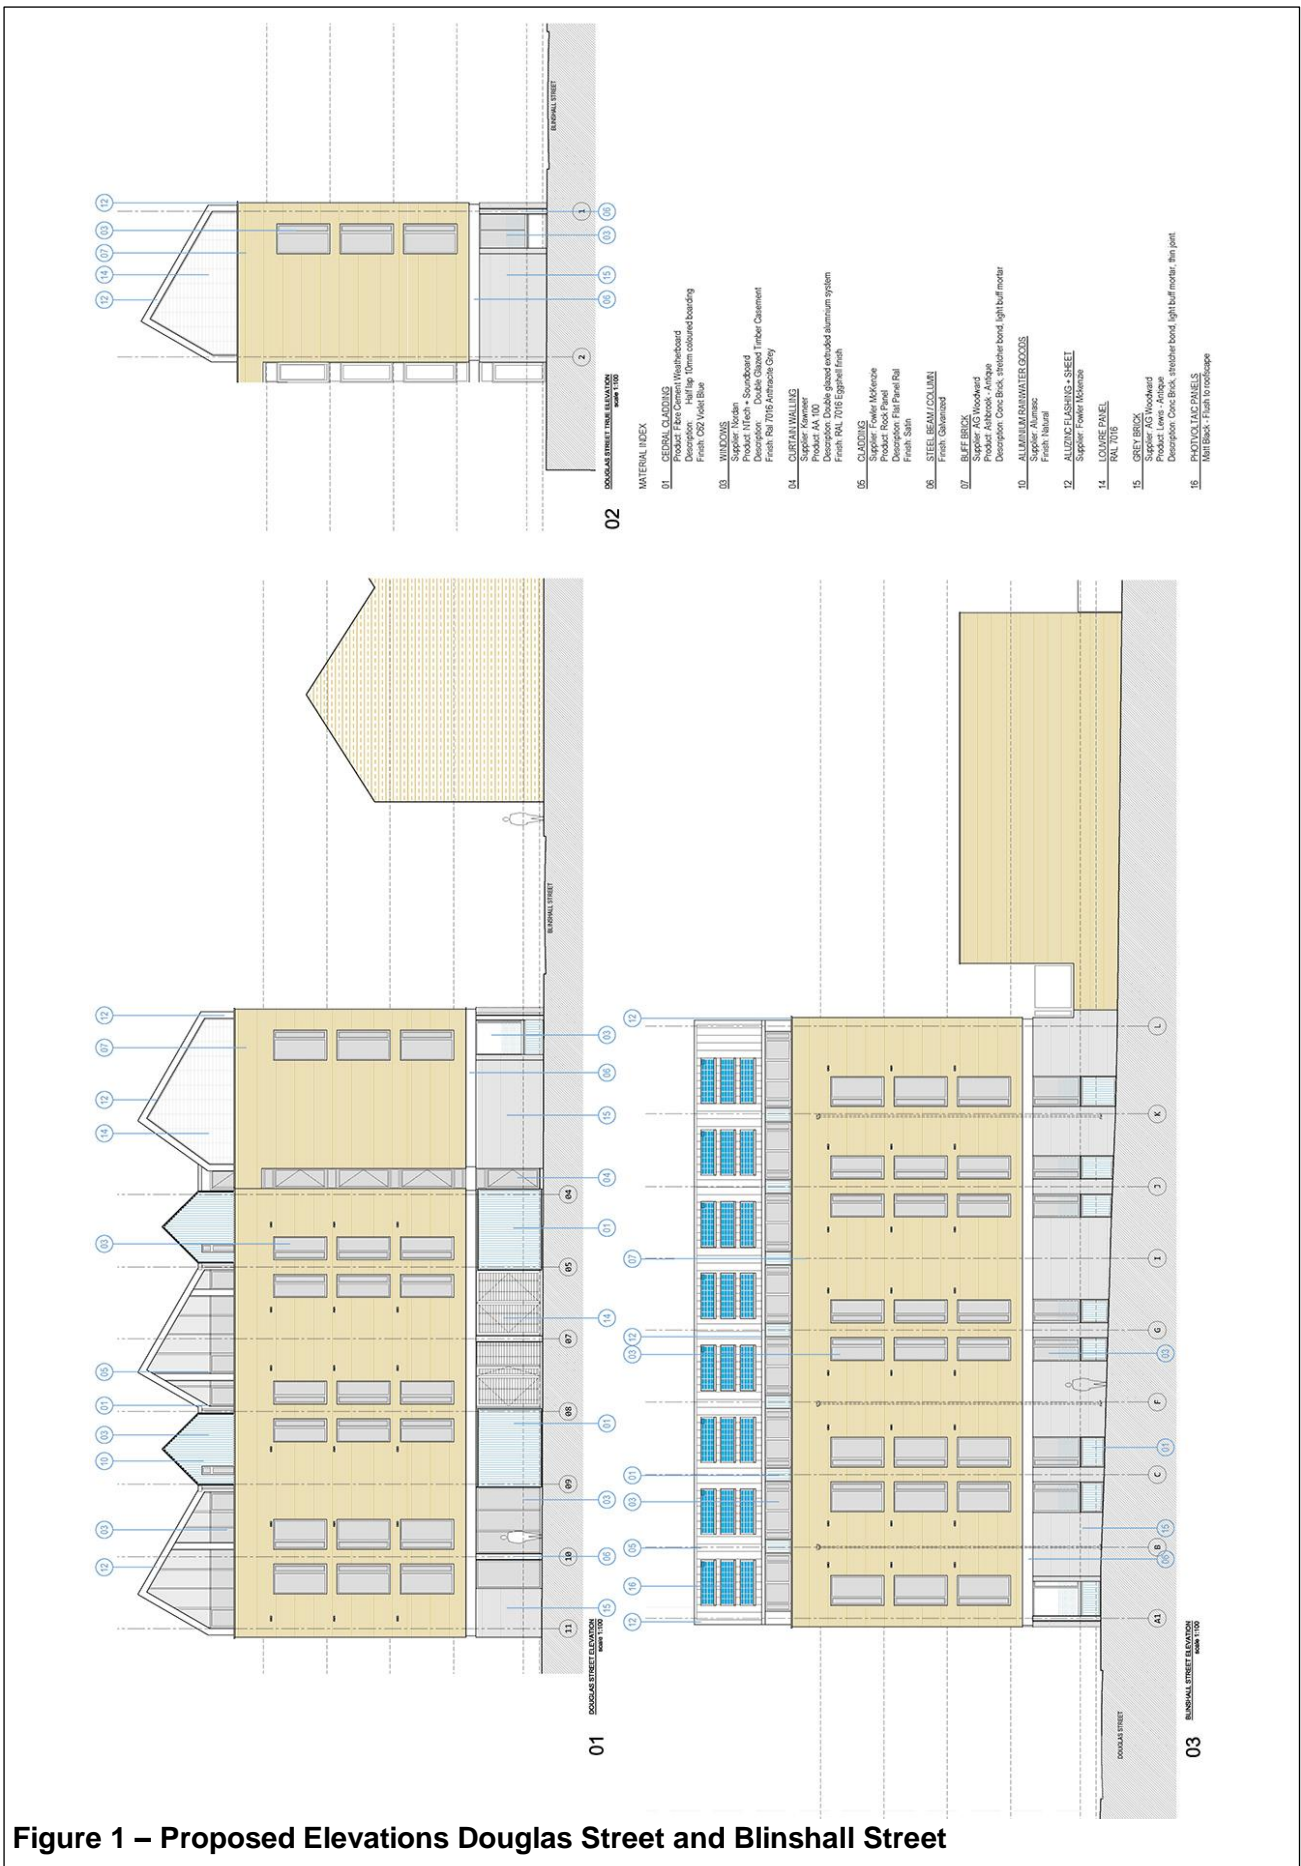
Proposed Elevations Douglas Street and Blinshall Street
